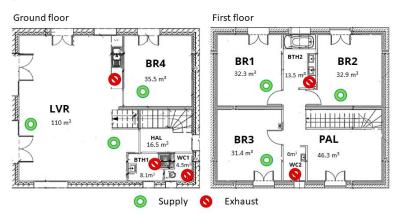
Plan of the case study house; supply and exhaust location for MVHR; exhaust location only for MEV
